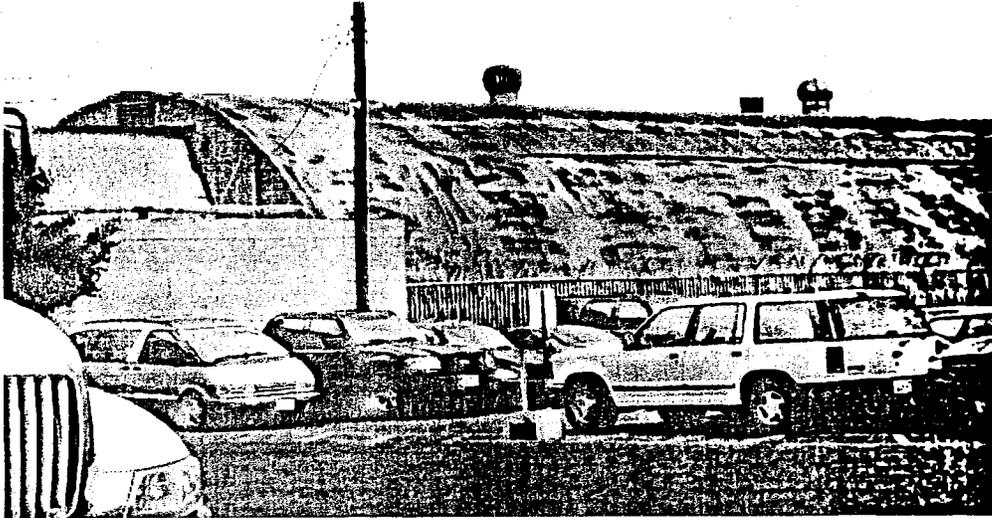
An industrial building located on Whiteside St. Note the rusted corrugated steel roof.
